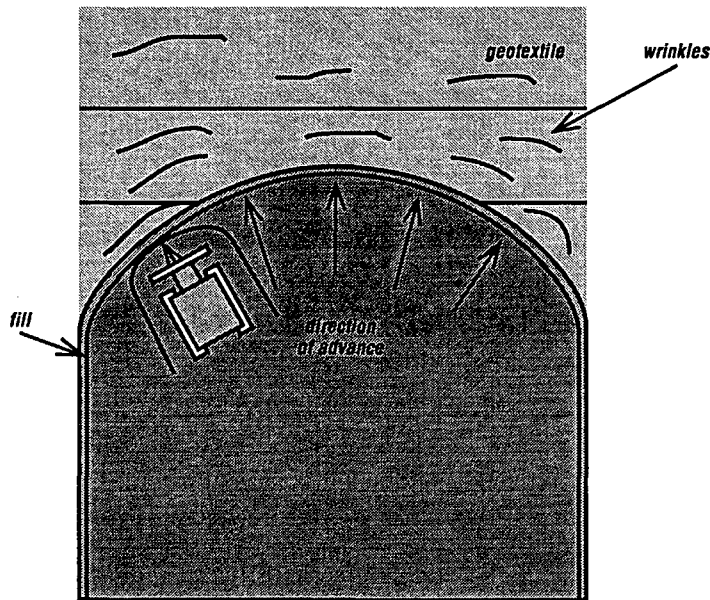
Fill placement over geotextile layer if mudwave does not form (1).
